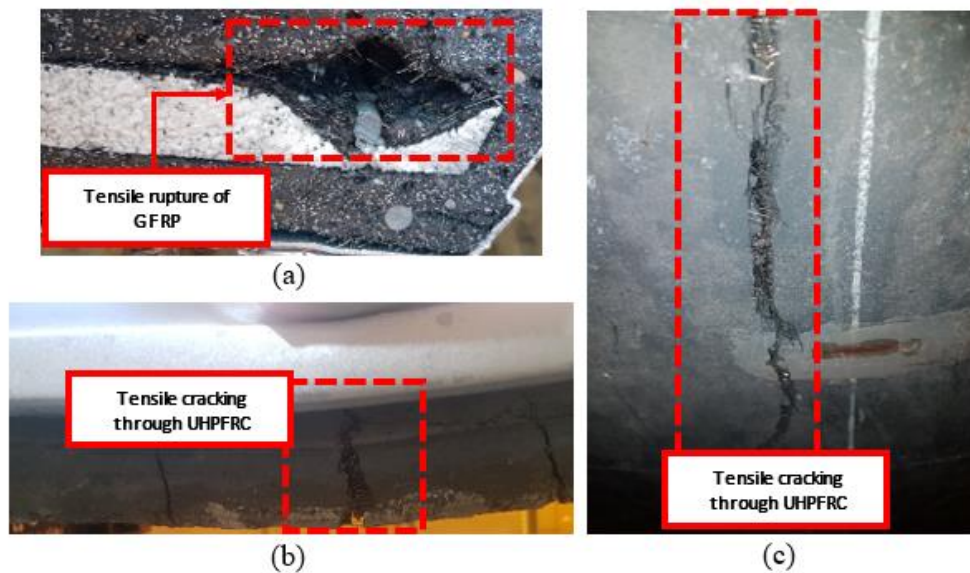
Failure modes of specimen B2-2: a) Tensile rupture of the longitudinal GFRP reinforcement and splitting of the surrounding concrete cover; and b) Primary crack in UHPFRC layer.
